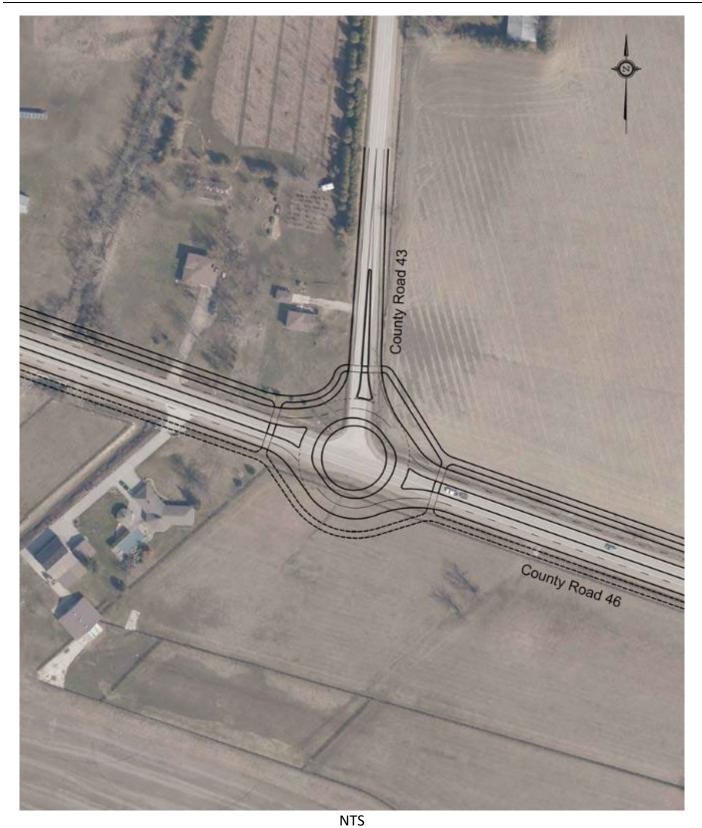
County Road 46 and County Road 43 Intersection Alternative B
